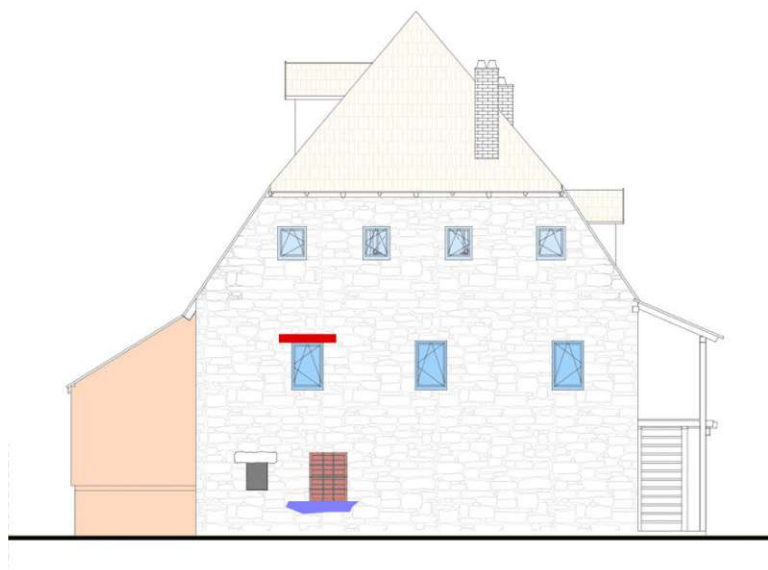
Building defects and history of interventions in the South façade of the building
